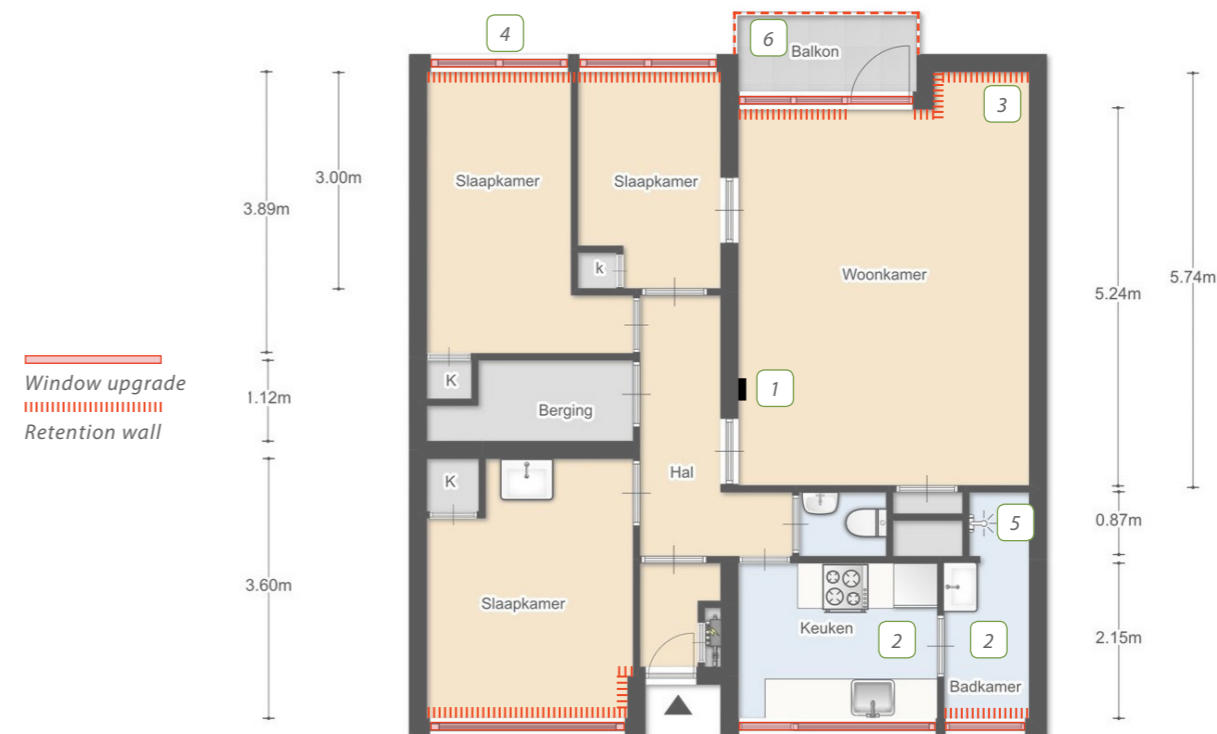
Plan of the Eerste Helmerstraat 18a (3rd floor). It is safe to assume this floor plan is repeated throughout the rest of the building, with exception of the ground and first floor. The illustration is retrieved from Funda.nl and made by droomhuis360.nl
